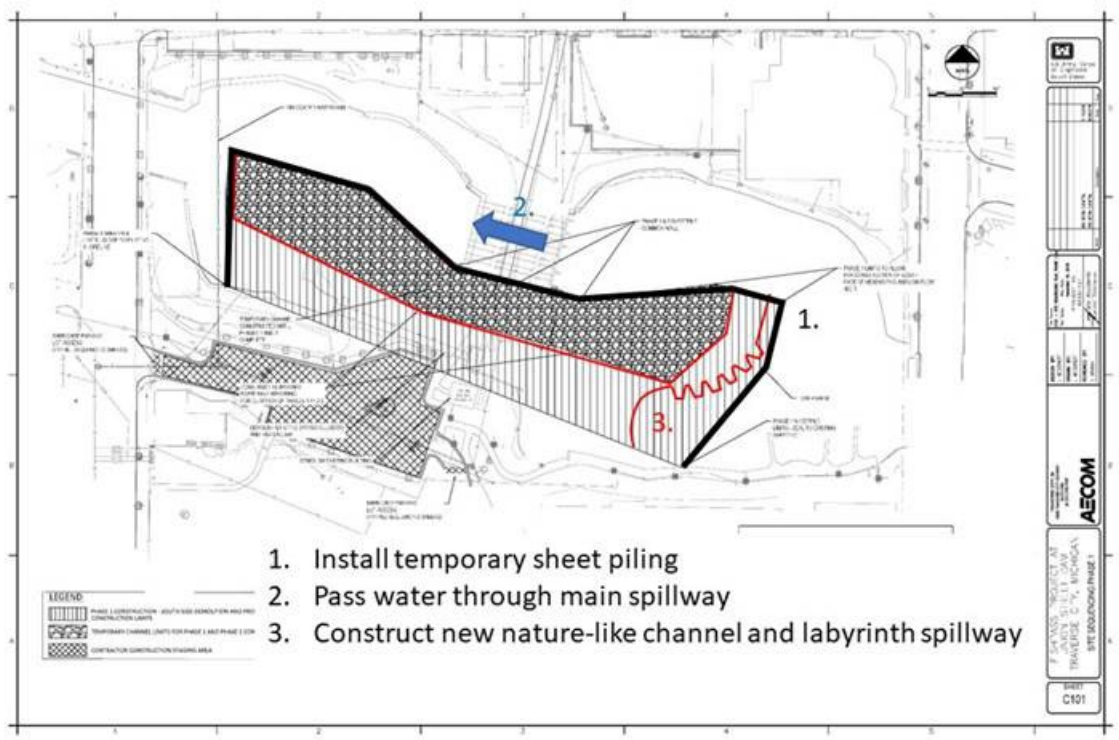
Phase 1 steel sheet pile cofferdam plans. Black line indicates the approximate location of the sheet pile wall.
